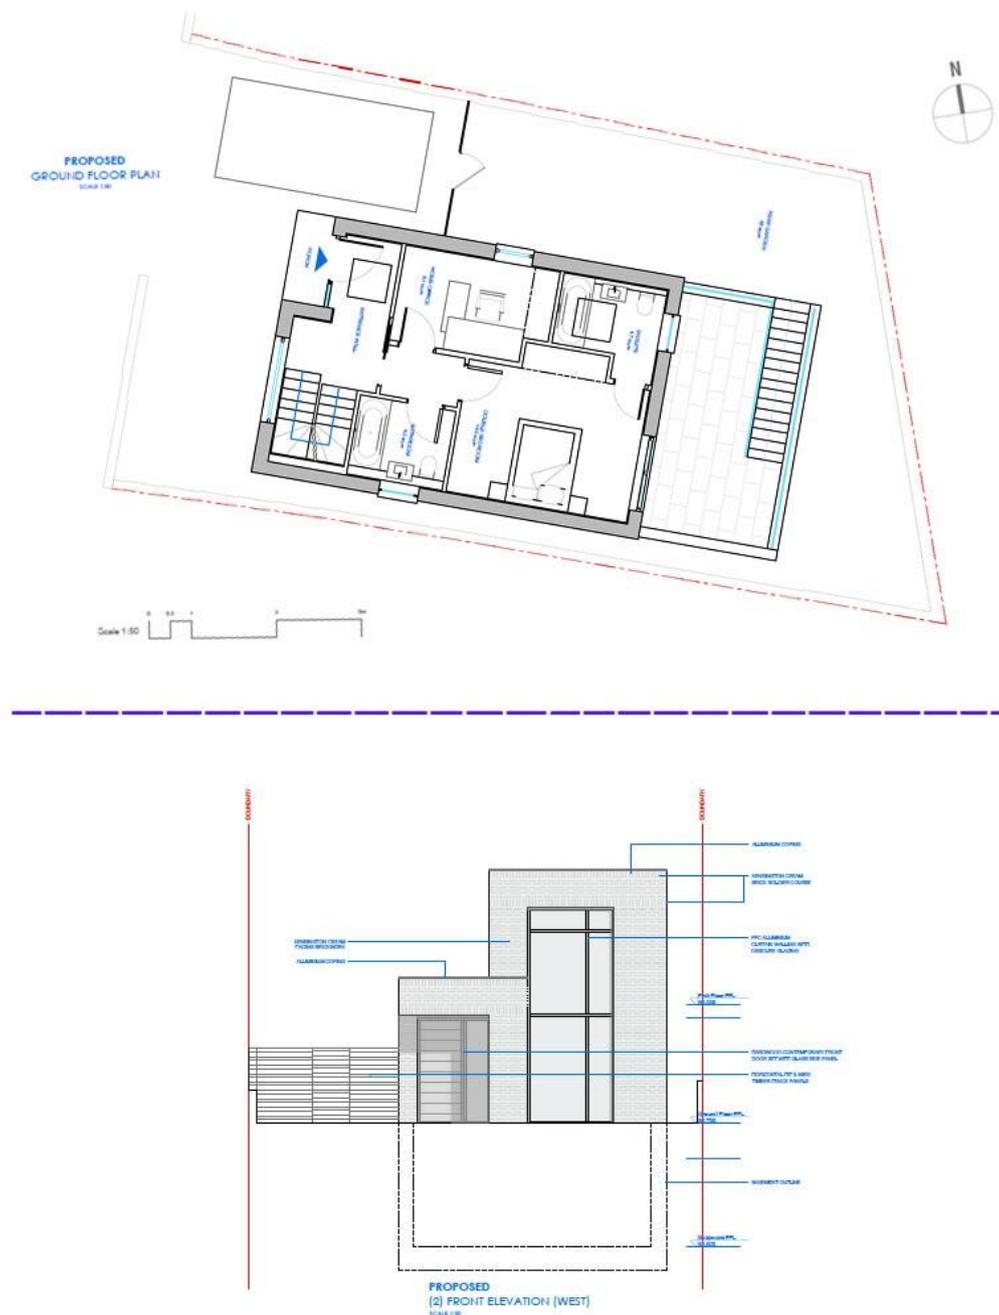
Ground floor plan (within site outline, red) and front elevation of the proposed development
